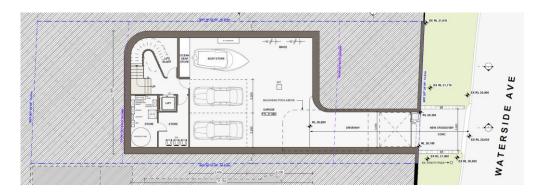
Proposed basement floor plan (Source: MHNDUnion)
